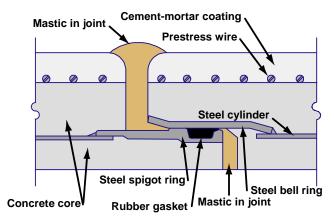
Prestressed concrete cylinder pipe (PCCP) details (lined cylinder).
